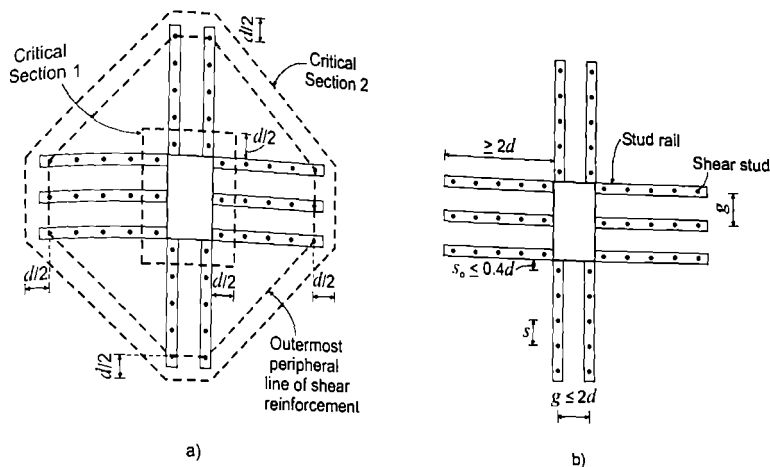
Stud arrangement for an interior column location: a) critical sections, and b) stud spacing.
